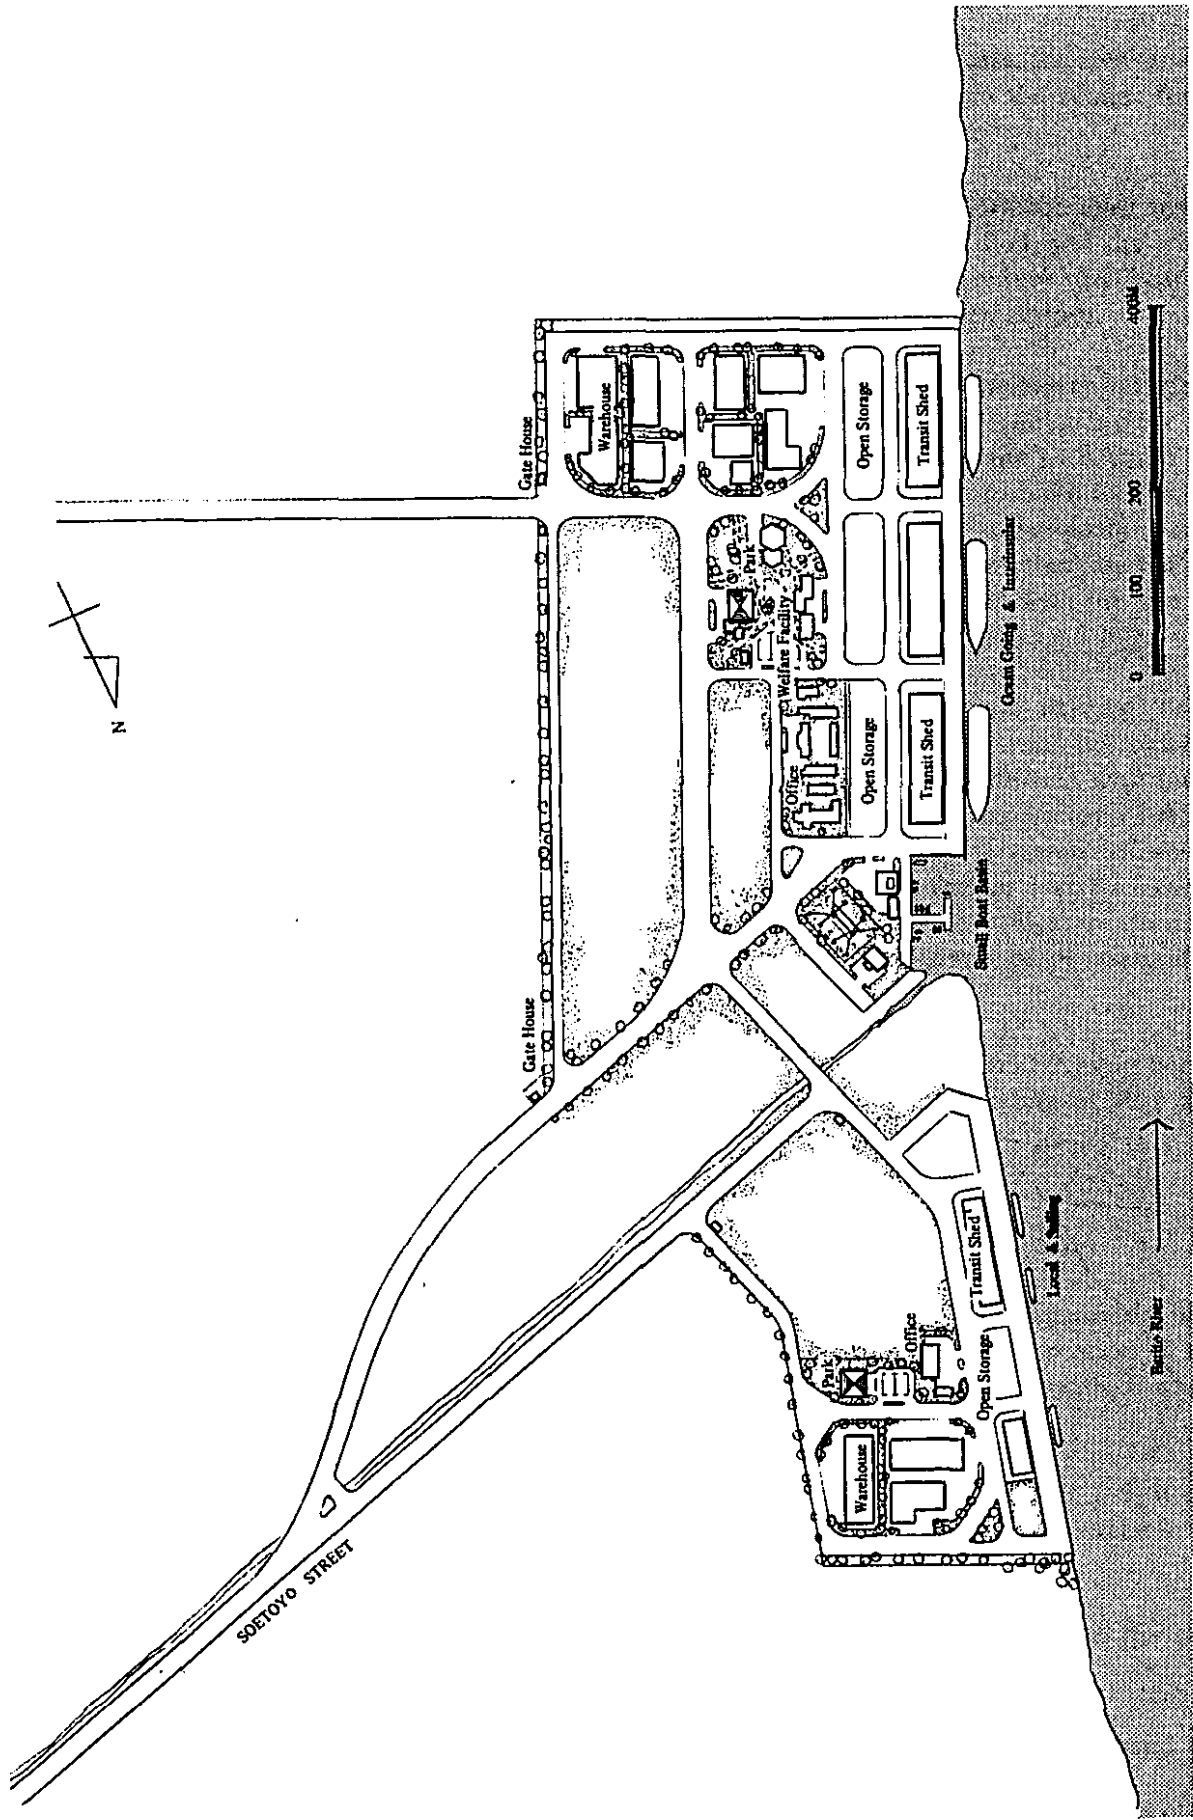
Layout of Port Terminal Facilities (1983)
